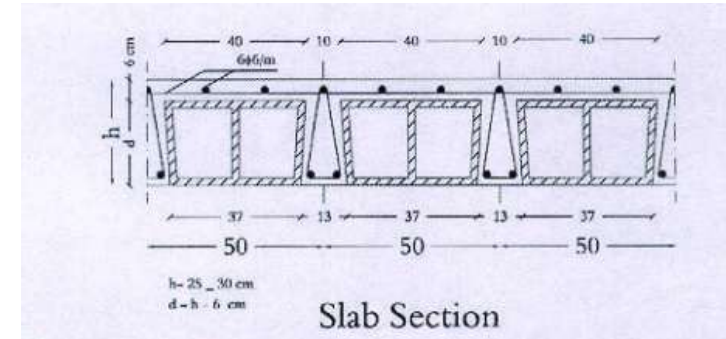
Slab section, EERI, Awad, Hwaija, Isreb and Ravi, 2002
